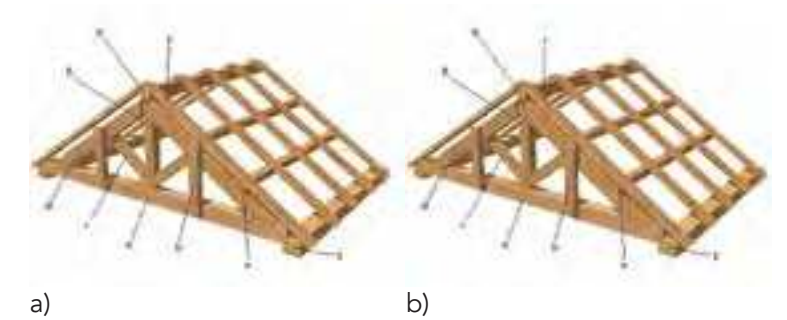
a) Japanese roofing structure – Nijubari Koyagumi; b) Western roofing structure - truss (credits: Mokuzoujikutumihou, Wikipedia.jp, 2011)
